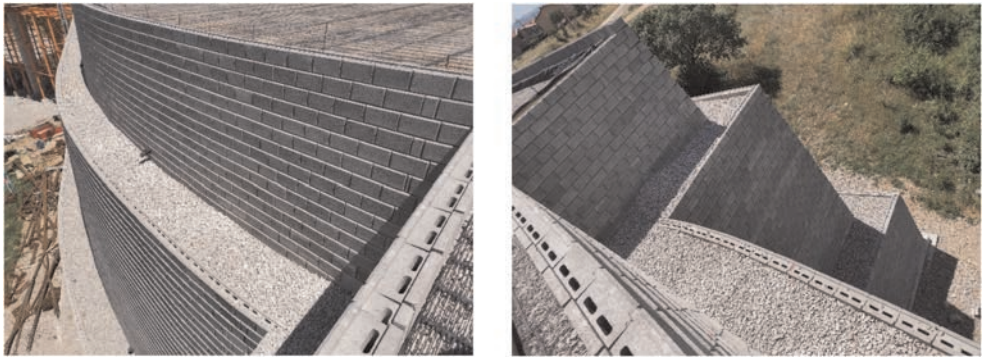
Connection between wing walls and bridge abutments: a) Curved wing wall; b) Angular wing wall.
